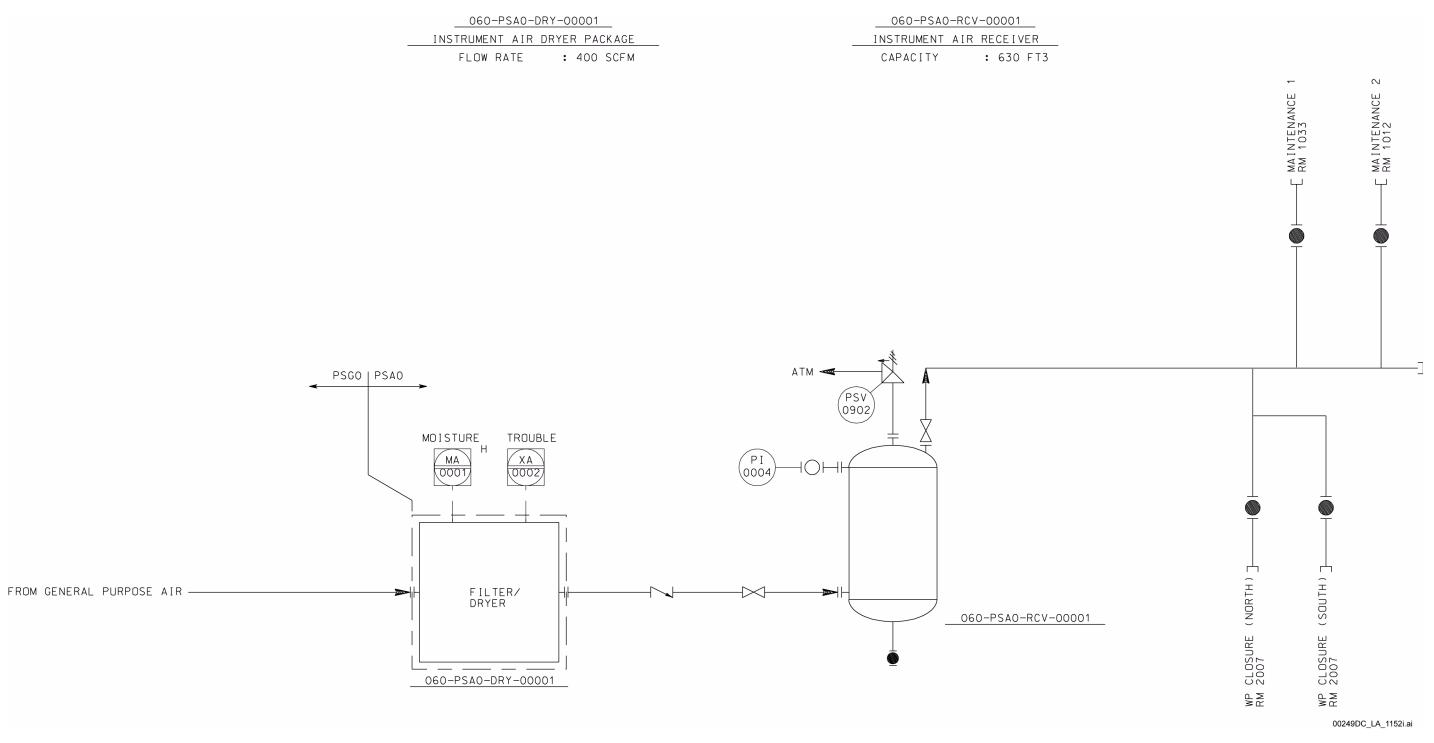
Canister Receipt and Closure Facility Instrument Air System Piping and Instrumentation Diagram
